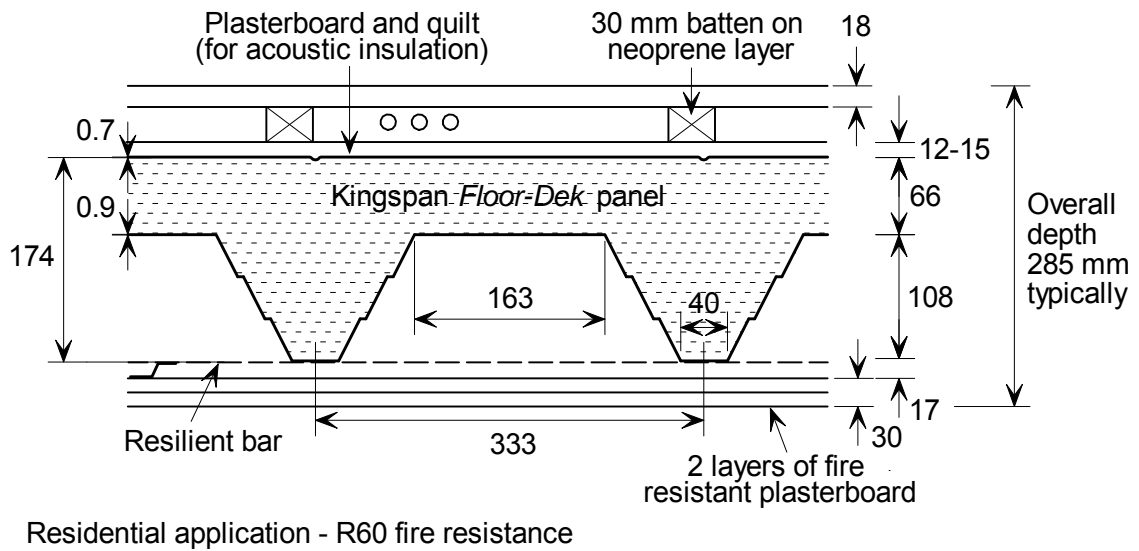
Use of *Floor-Dek* as a separating floor in residential buildings
